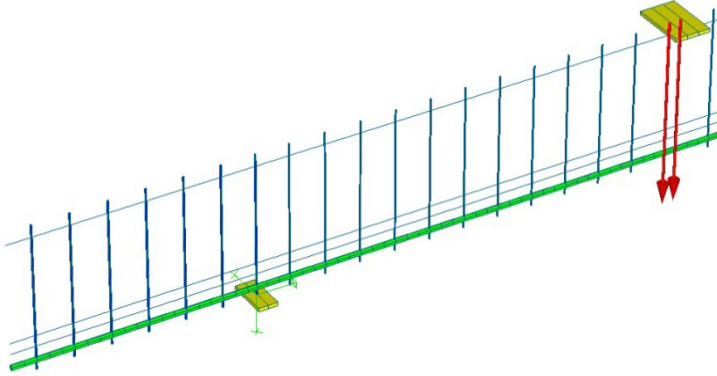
Elements type bars for reinforcement, prestressing and loading plates
